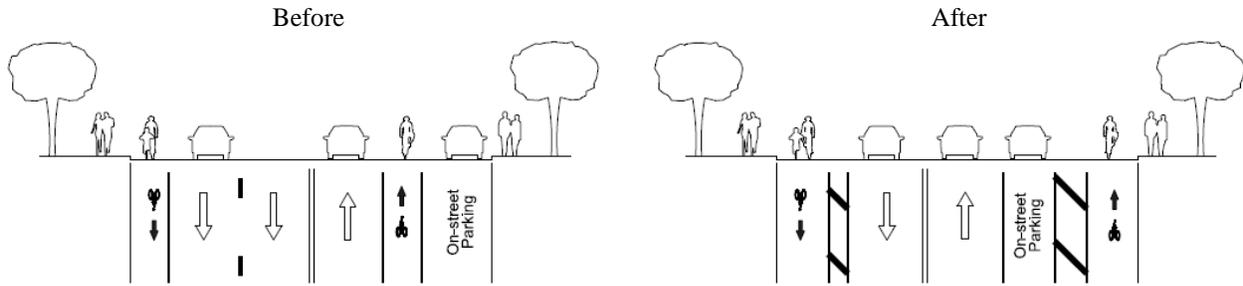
Typical Cross Sections for San Jacinto Boulevard
